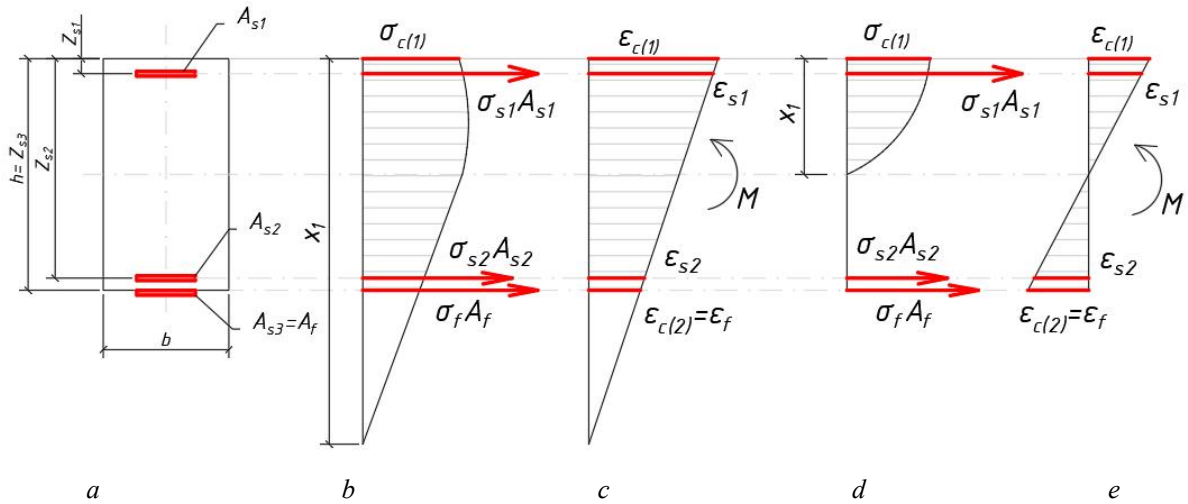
Scheme of stresses and deformations in reinforced concrete section:
